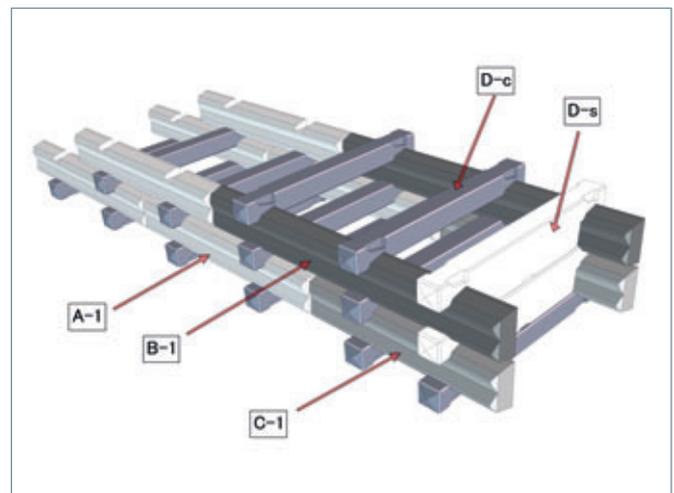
and 6: Cross Beam Retaining Wall filled with crashed stones
